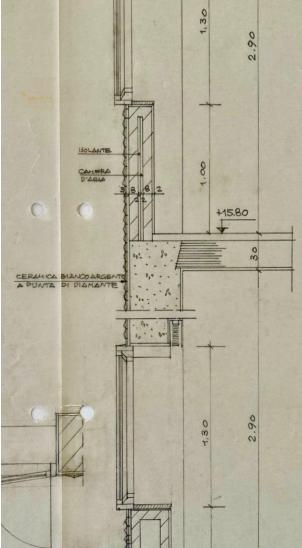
Studio Ponti Fornaroli Rosselli, Façade detail. Parish residence facing the church square, 28th April 1961, scale 1:20 (part.) © CSAC Centro Studi e Archivio della Comunicazione, Università degli Studi di Parma, Fondo Gio Ponti.
